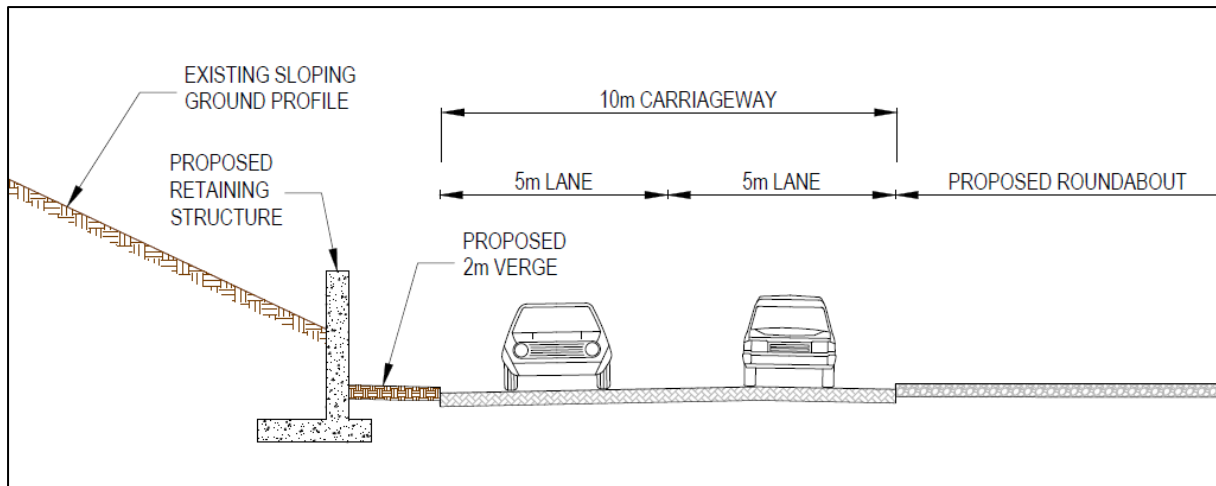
Proposed Retaining Structure for Roundabout Construction
